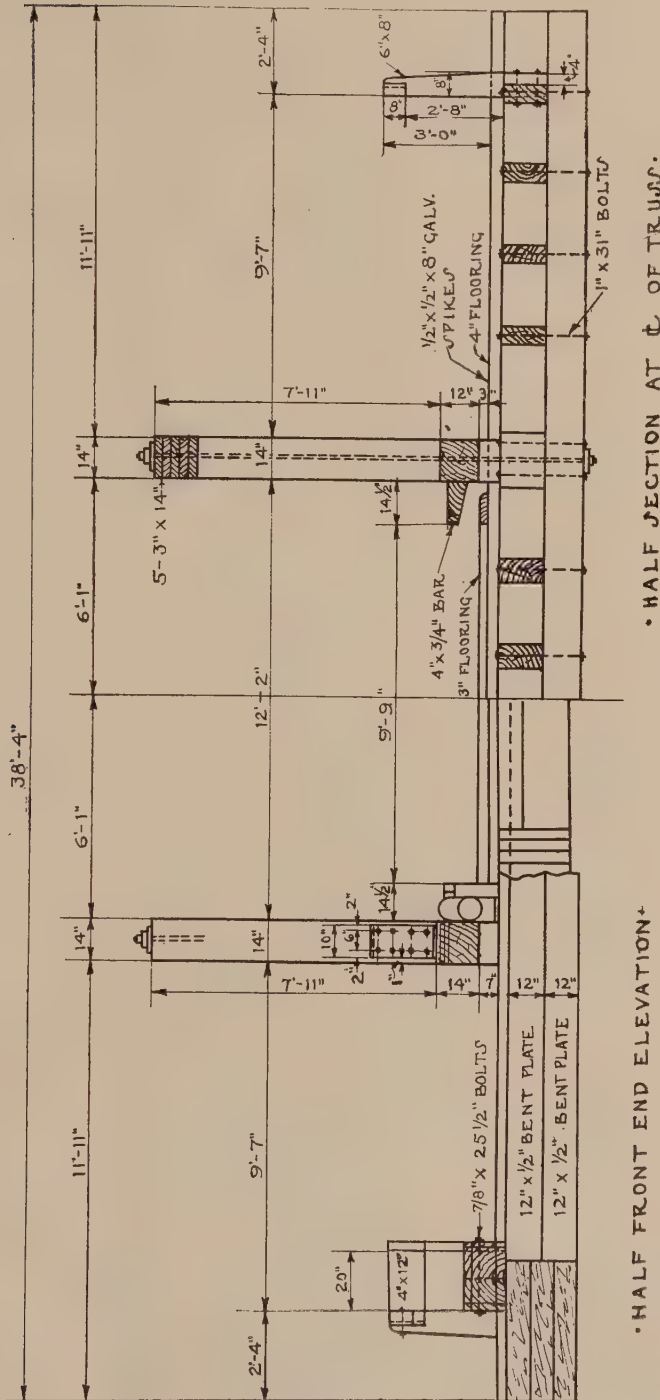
Half elevation and half-section through truss illustrated in Fig. 138.
